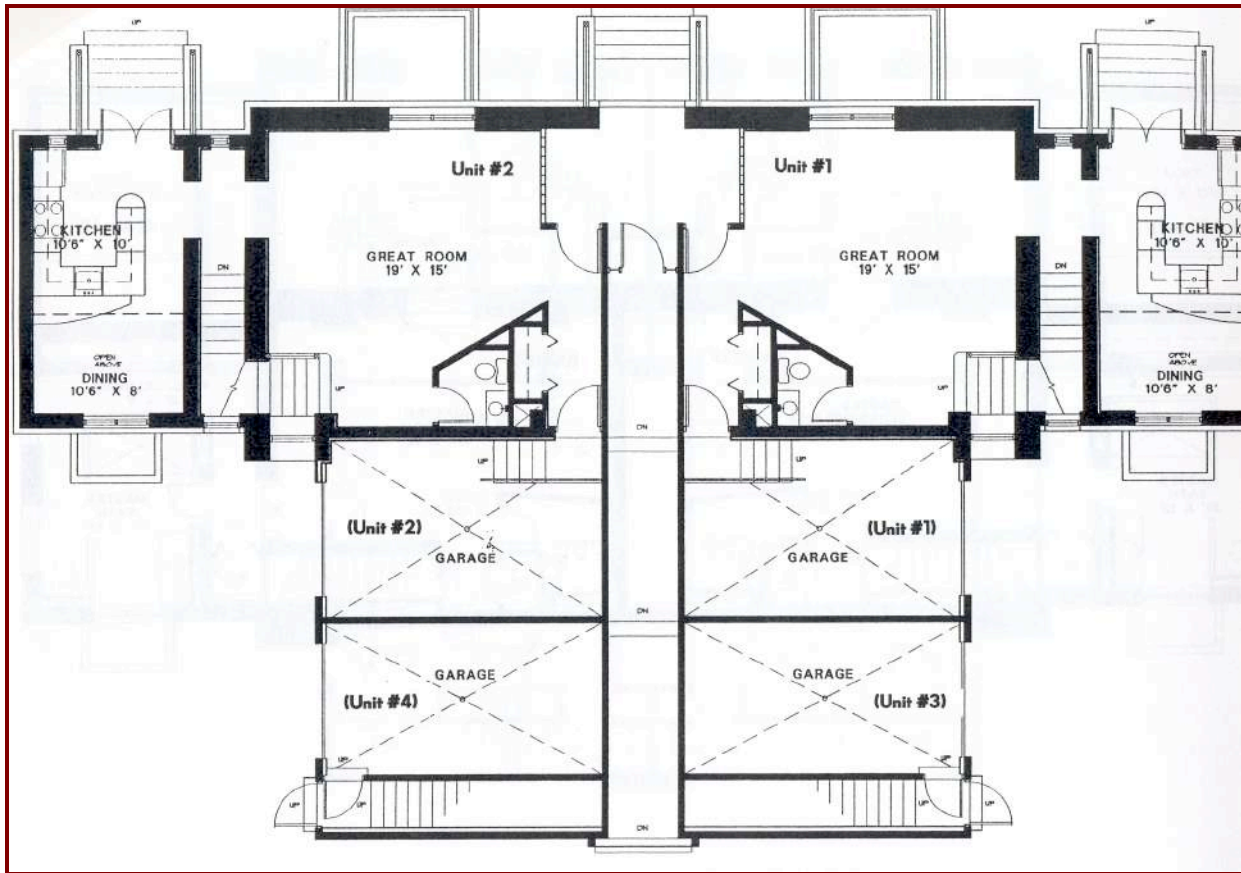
Current layout of the Baths' main floor. Separate entrances for men and women were originally built at opposite ends of the building (facing north off the kitchens). The garage facilities are new construction.
